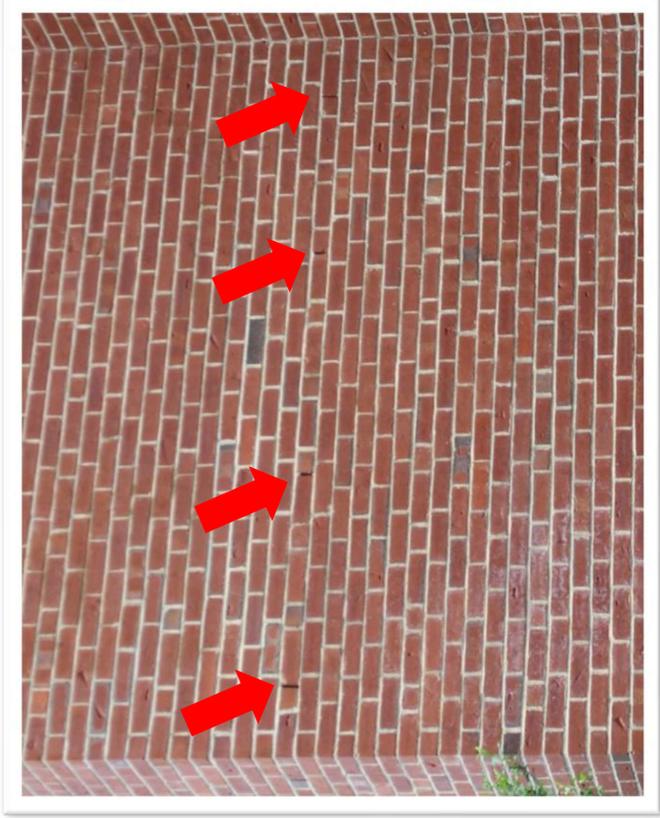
1980 brick masonry wall, constructed with brick veneer cladding. Note the weep holes provided for the barrier wall drainage system.
